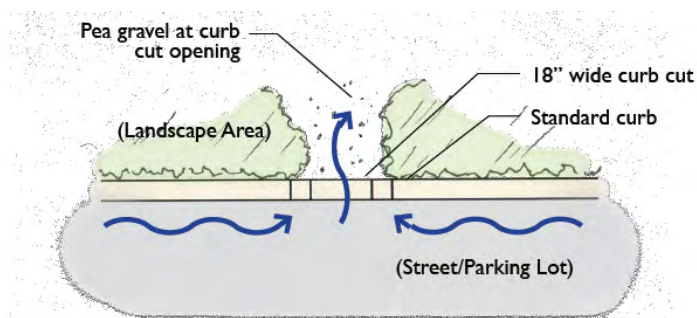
Standard curb cut: plan view (Source: SMCWPPP 2009)
